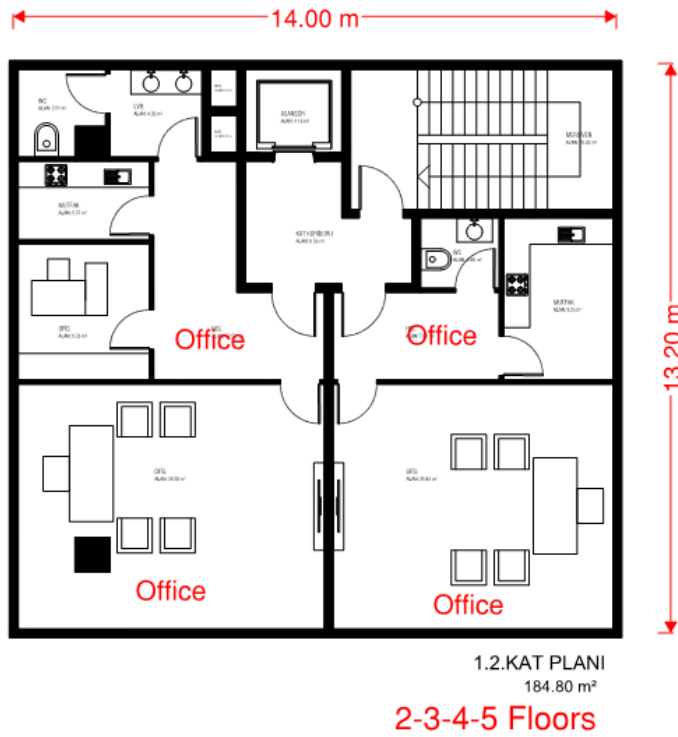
3 Typical Floor Plans for 2nd. 3rd. 4th and 5th Floors
